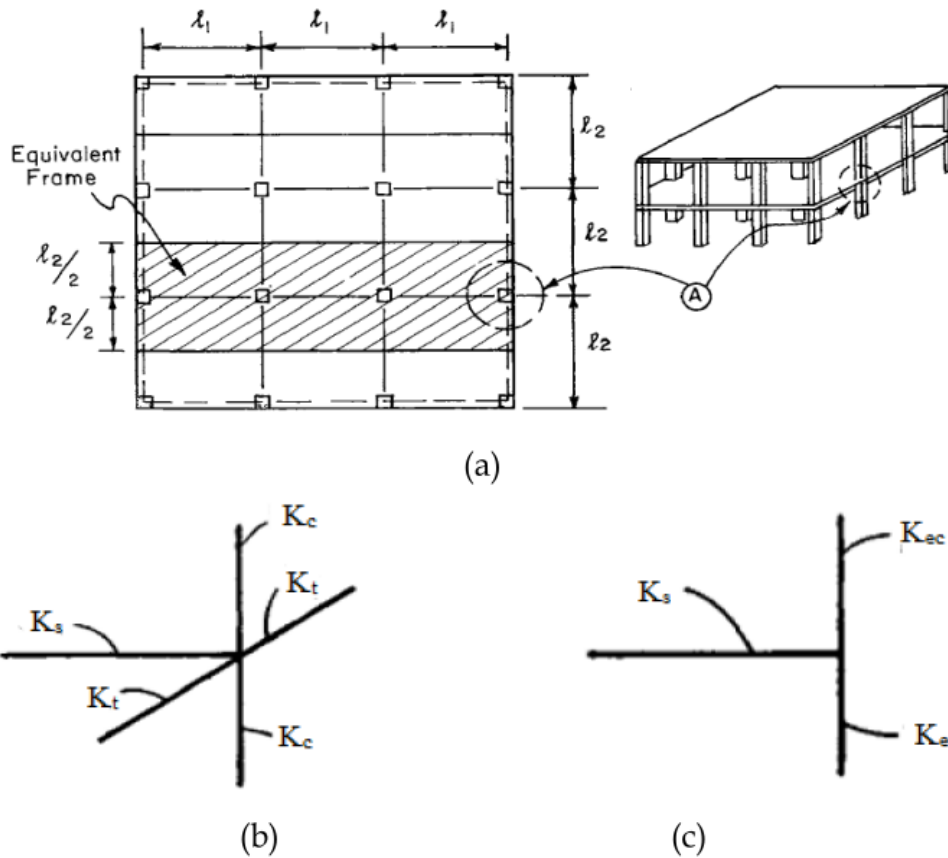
Member configuration assumed in ACI: (a) Definition of equivalent frame; (b) Members of 3-D structure, Detail A; (c) Members of ACI EFM, Detail A
